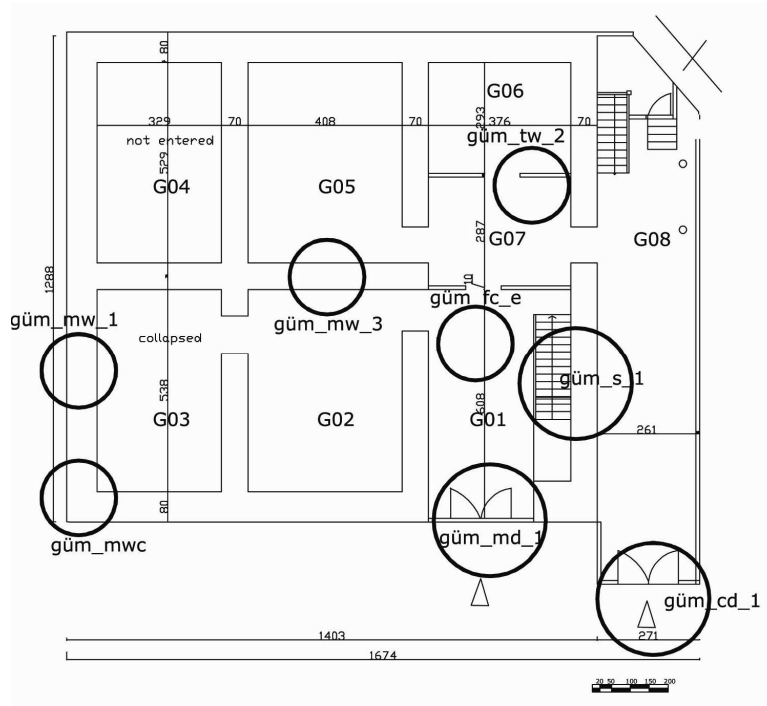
Drawing The plan of the ground floor of Gümüşler House. Çelik, 2008.
